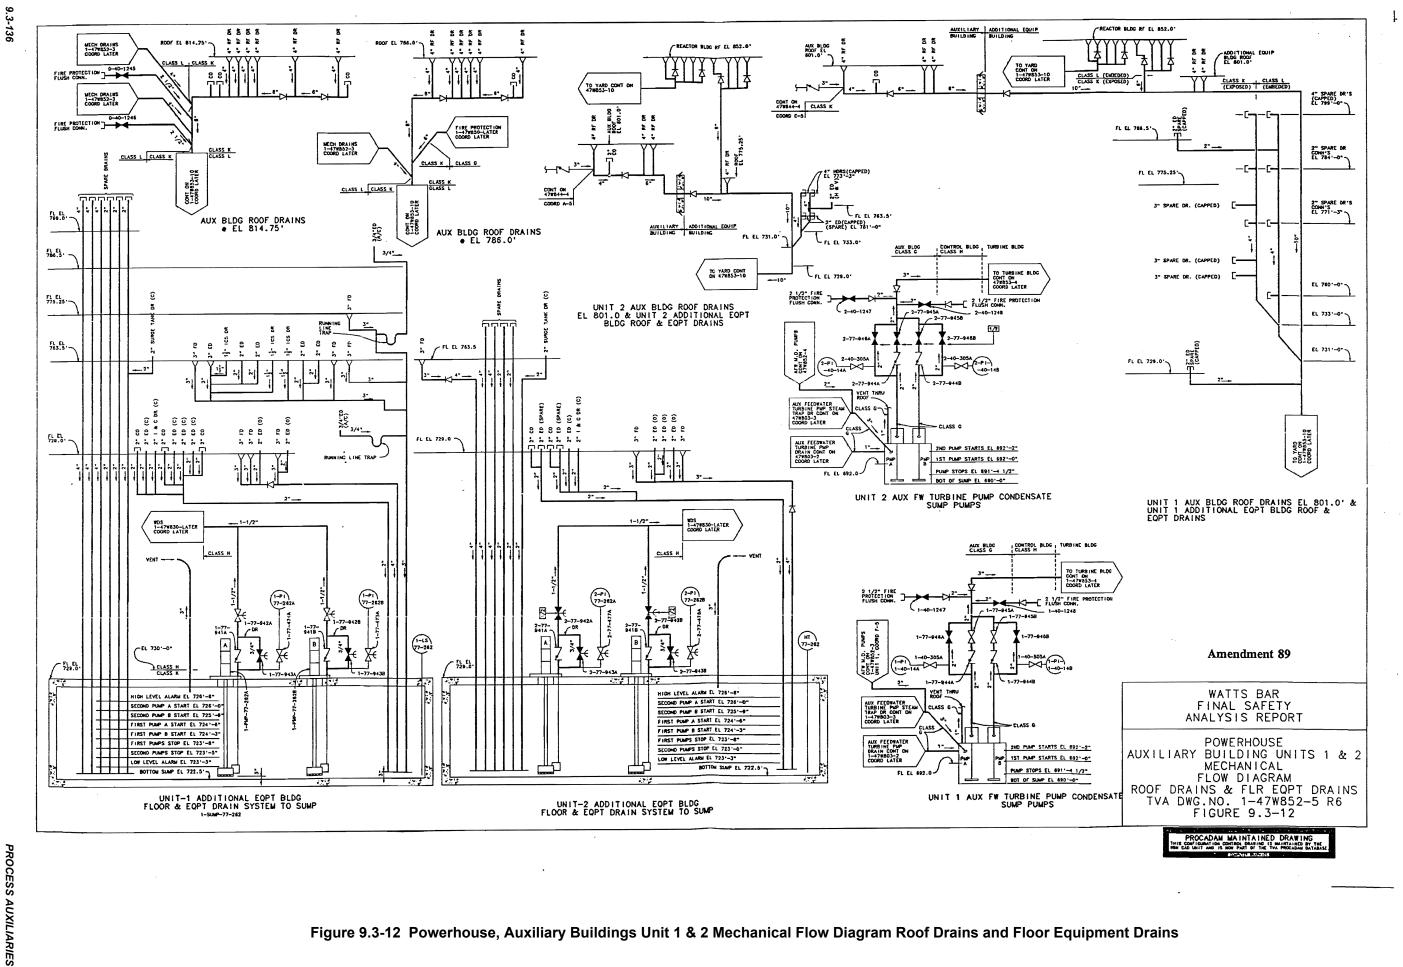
Powerhouse, Auxiliary Buildings Unit 1 & 2 Mechanical Flow Diagram Roof Drains and Floor Equipment Drains
